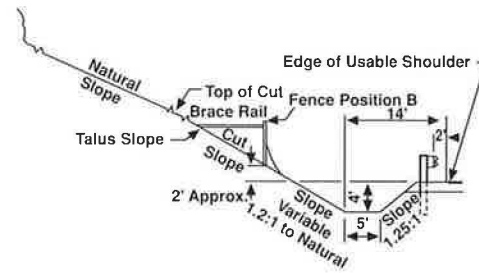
Roadway section on talus slope—Design B, fence position B.
